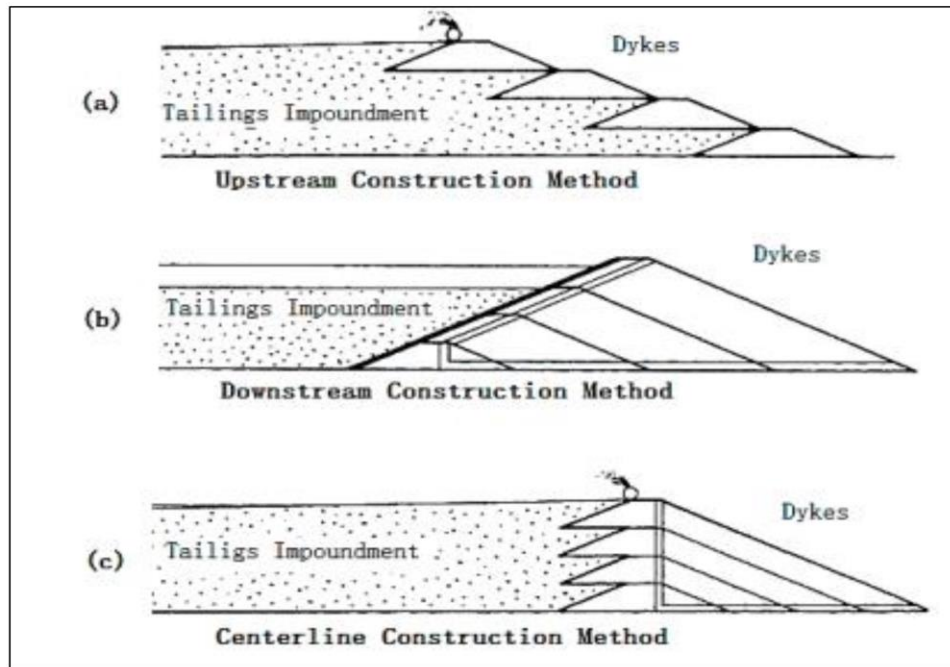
Methods of Tailings Dam construction (Bhanbhro, 2014).
